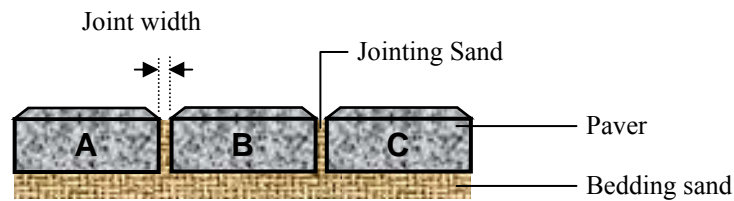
Components of concrete block pavement (Shackel, 2003)
